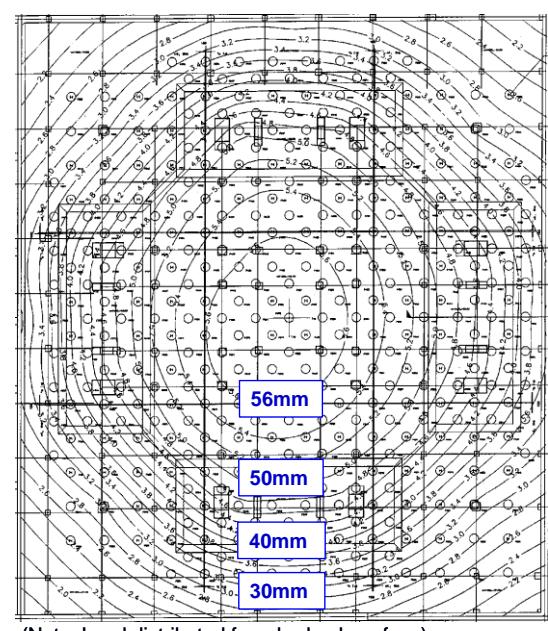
Bedrock compression under group piles of tower area (under sustained load at low groundwater level)
